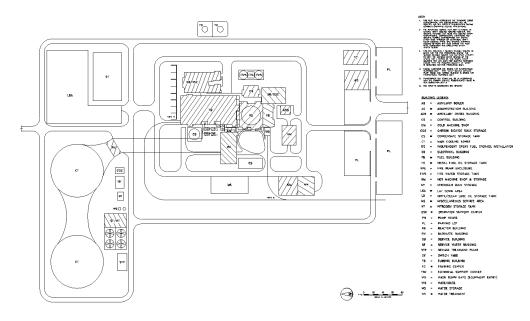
ESBWR Plant Layout, Site Plot Plan
